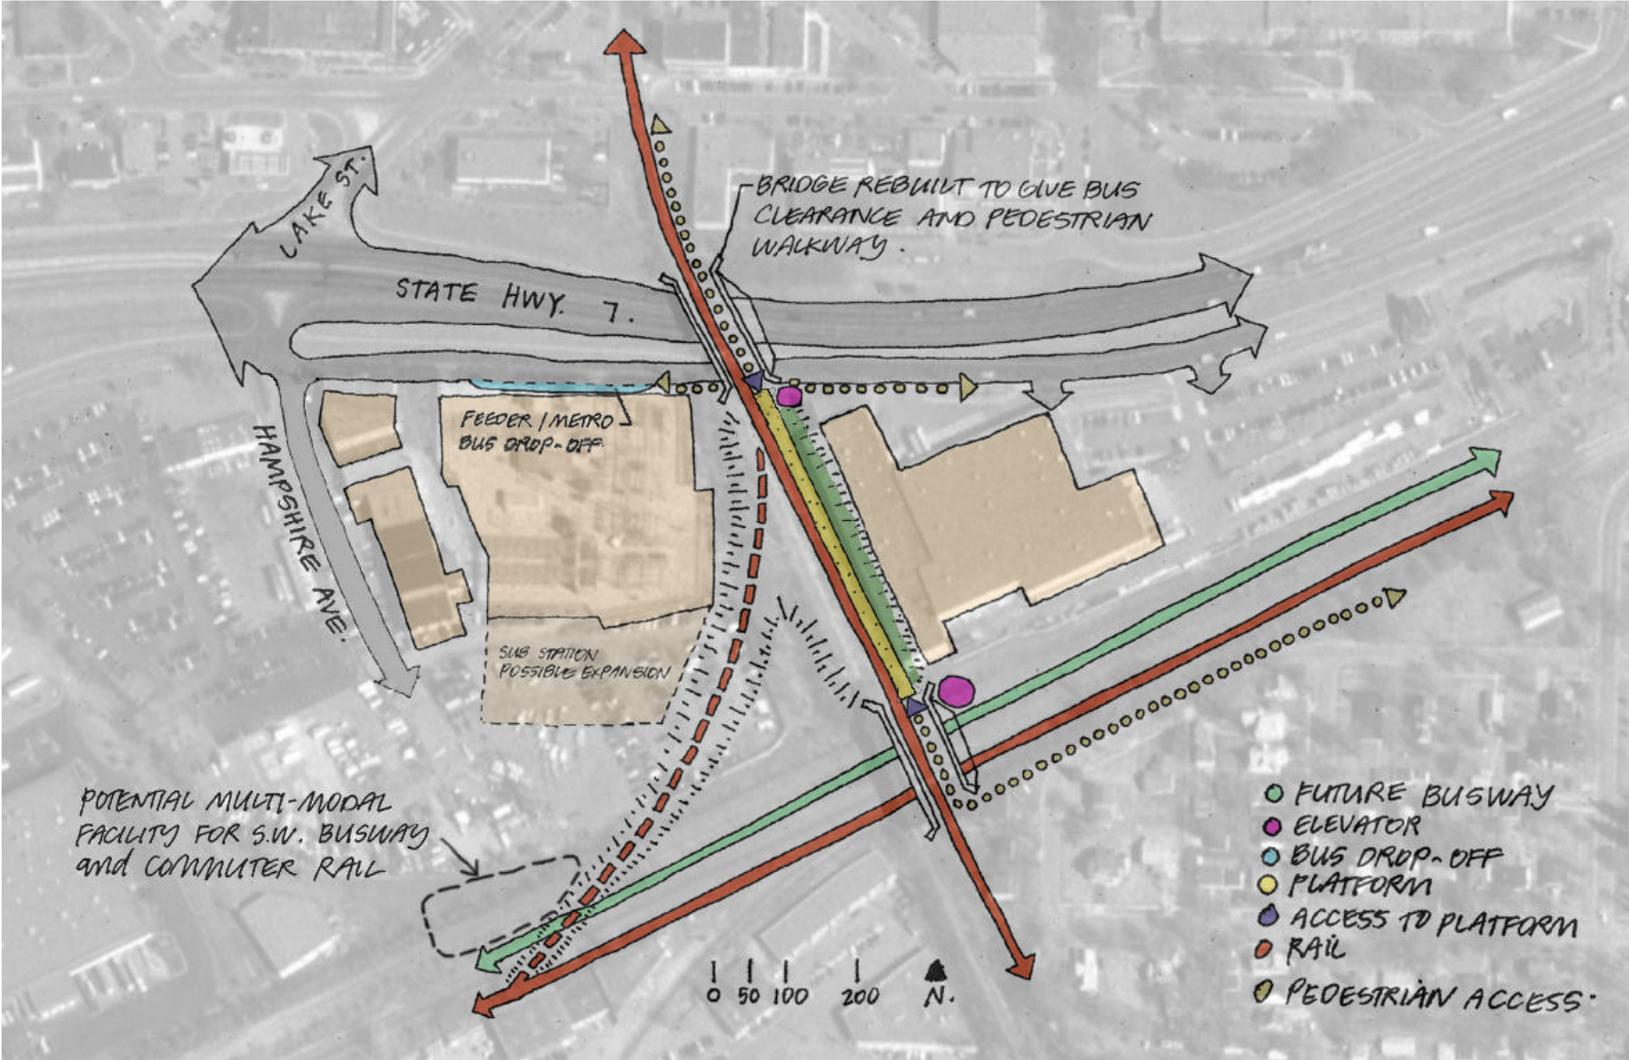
St. Louis Park South, Platform Plan/Elevation
